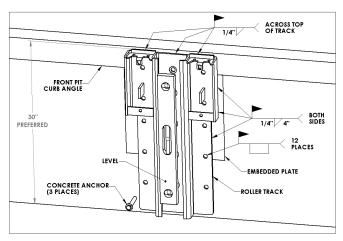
D—WELDING ROLLER TRACK FRONT VIEW (WITH EMBEDDED PLATE)
